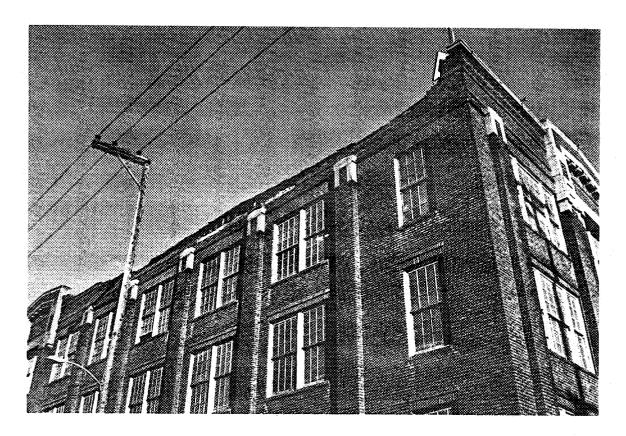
Parapets fell down in this unreinforced masonry building on Campbell Street in Oakland
